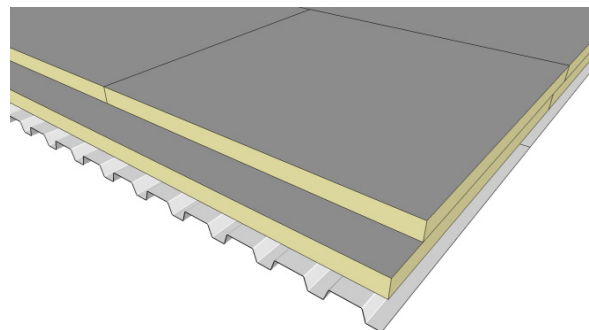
Duro-Guard ISO II Flat On Steel Deck
